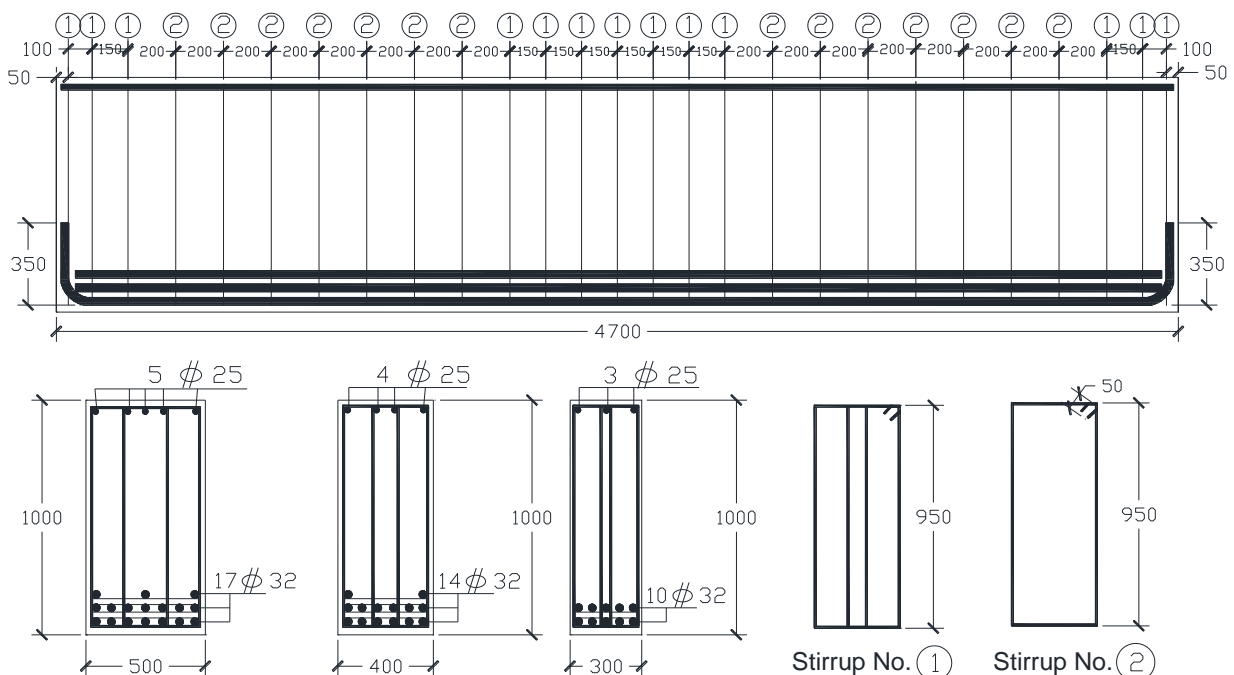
Geometrical details of the large-scale RC beams (all dimensions in mm)
